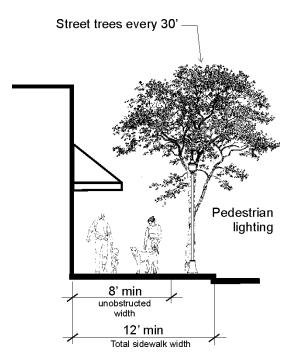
Minimum sidewalk requirements along pedestrian-oriented streets and where adjacent to facades of mixed-use and retail buildings greater than 100 feet in width.
